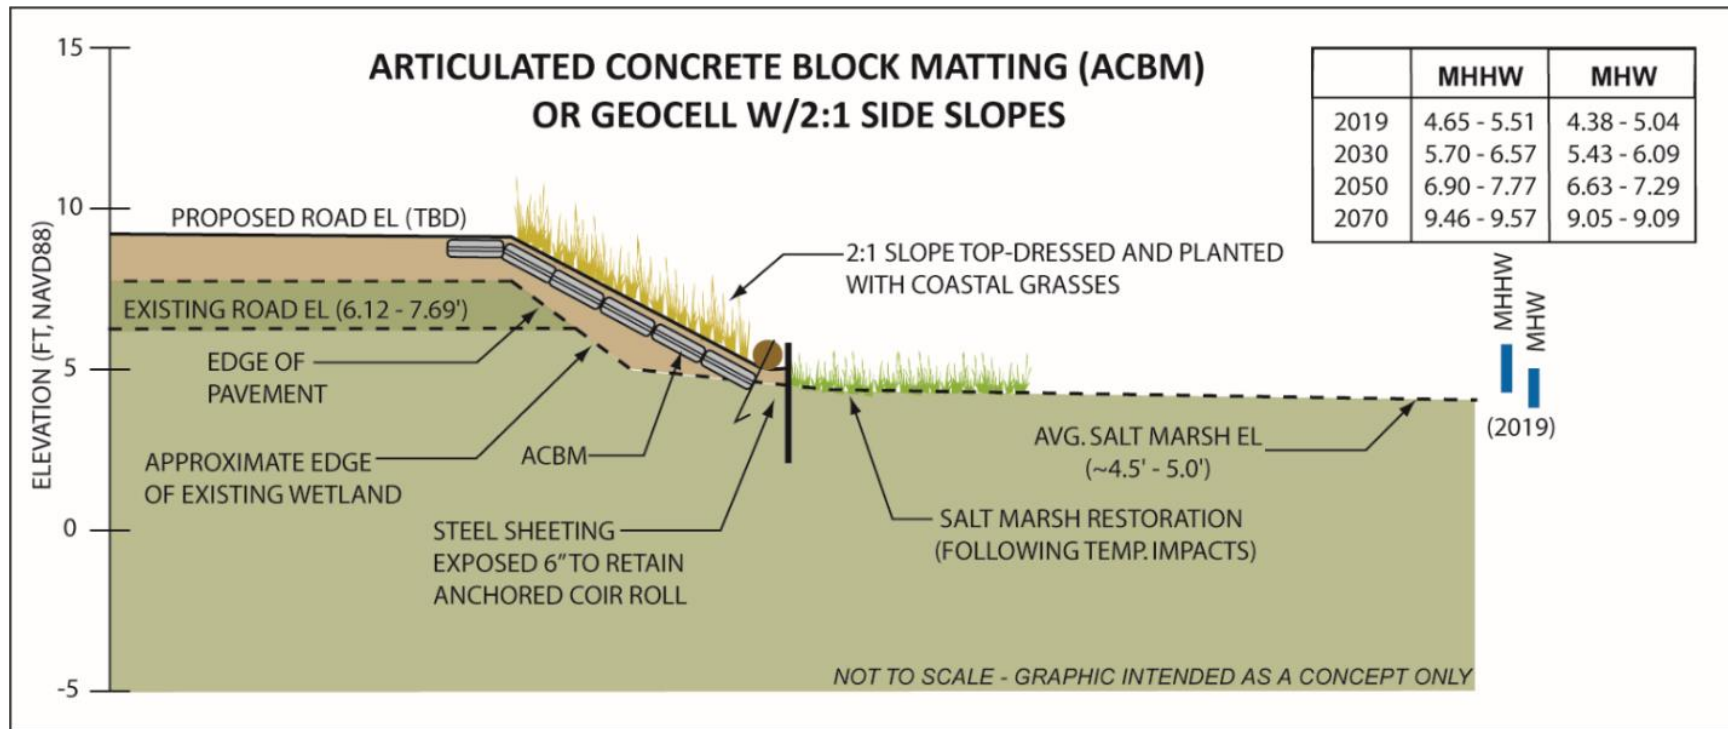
Raised roadway and ACBM-geocell alternative installed at 2:1.
